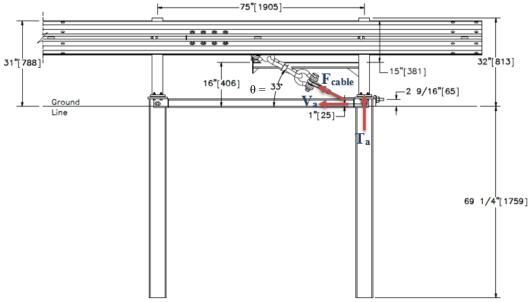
Steel-Post, Trailing-End Anchorage Design Concept No. 2
